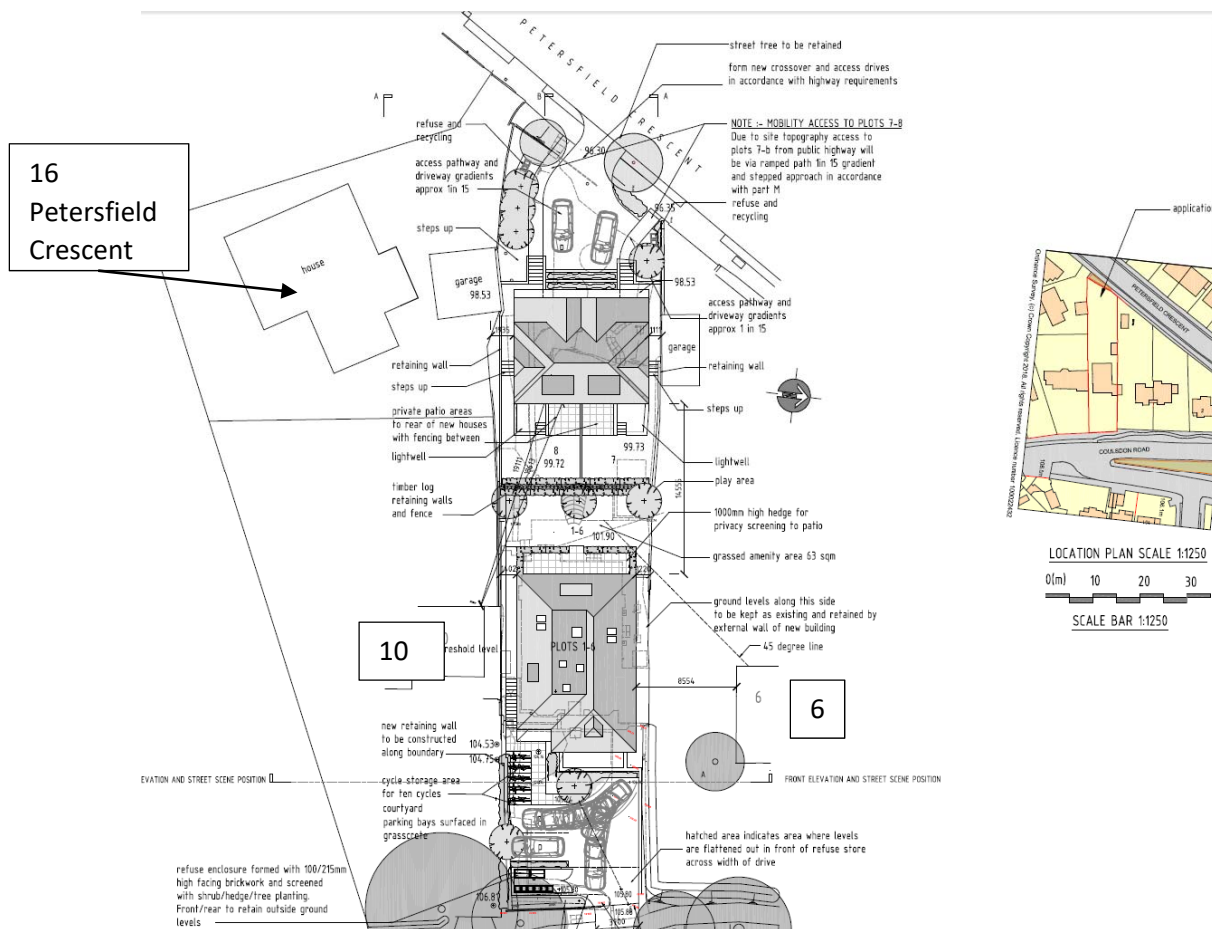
Proposed Block Plan highlighting the relationship with the adjoining occupiers.
